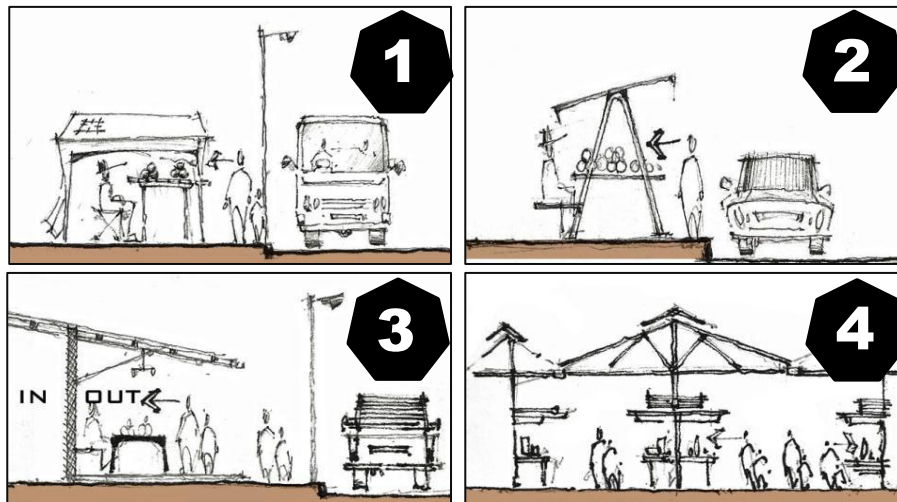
Street trade: Self built shelter, 2. Street trade: Prefabricated 'formal' shelter, 3. Street trade: Under 'formal' infrastructure' 4. Formalised Trade: Located internally under formal shelter. Source: Author
